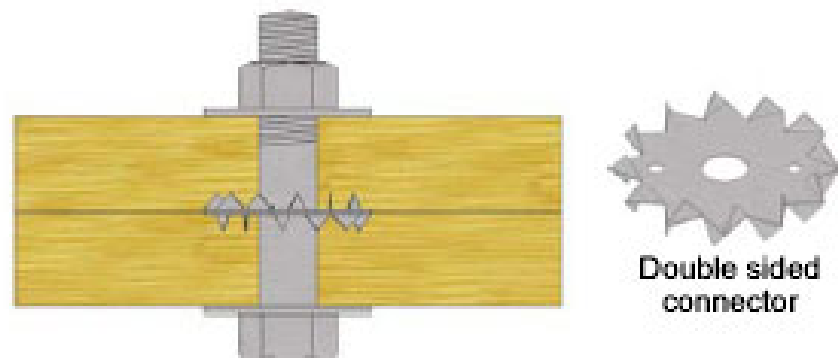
Timber connectors, Toothed plate connector www.cullen-bp.co.uk
